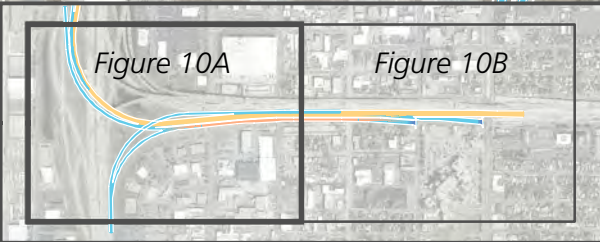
A Eastbound Weave Alternative I – Collector-Distributor System to Main Street
